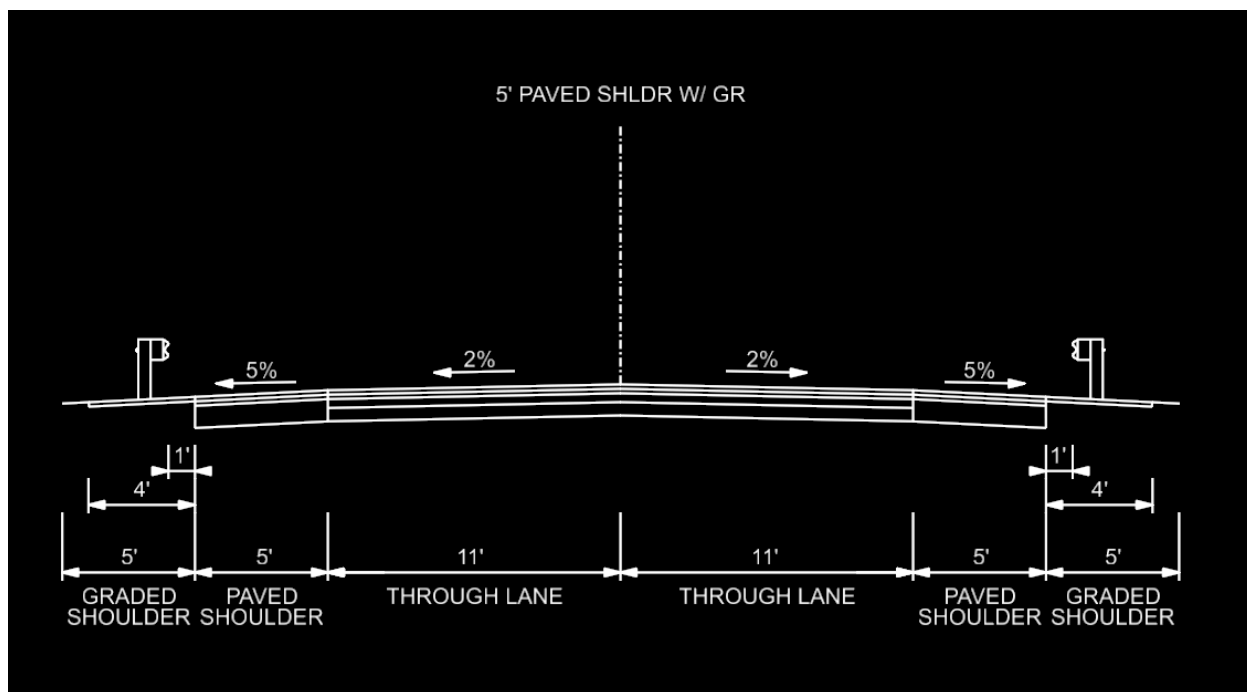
Typical Section of Undivided Two-Lane Rural Collector with Paved Shoulder and Guardrail
